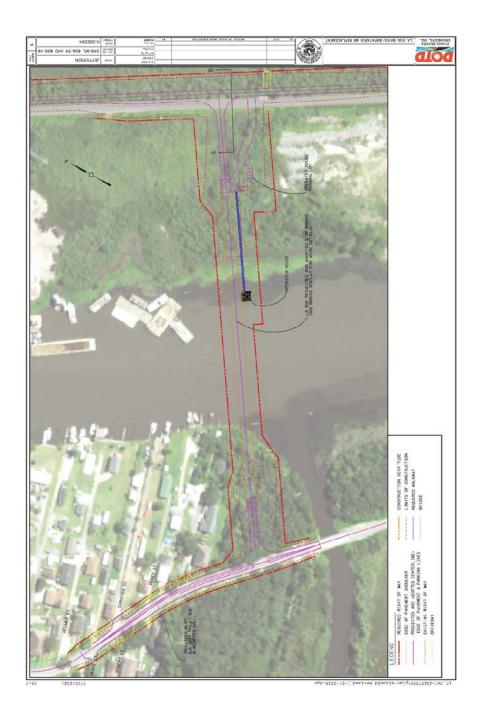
Plan layout LA 45, bridge (LA 302) and LA 3257.
